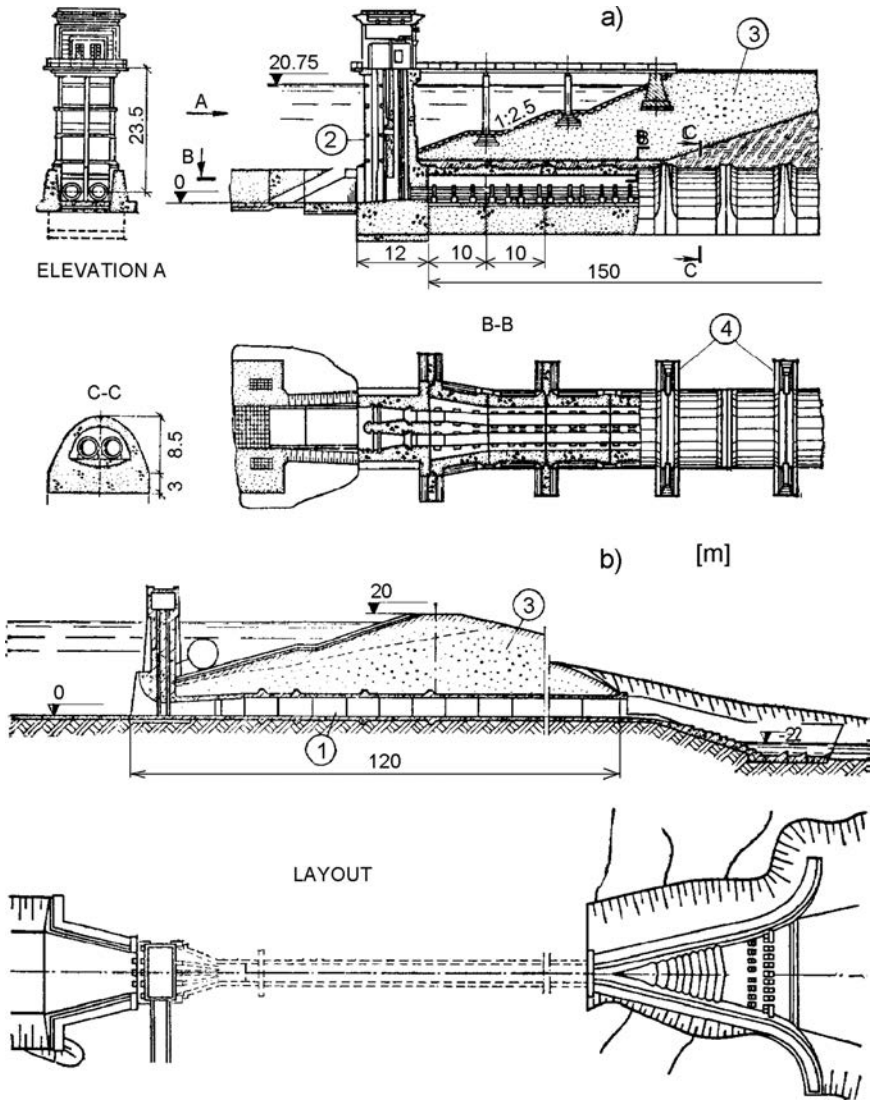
Outlet structure with a tower and gallery in which there are installed steel pipes (a) and reinforced concrete pipe (b) (after Grishin et al., 1979). (1) Reinforced concrete pipe; (2) tower; (3) embankment dam; (4) reinforced concrete cutoff collars.
